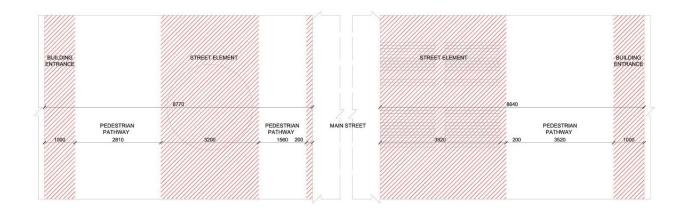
Street width and buffer spaces (in mm) for Gateway 7 in the area surrounding Frankfurt am Main Hauptbahnhof
